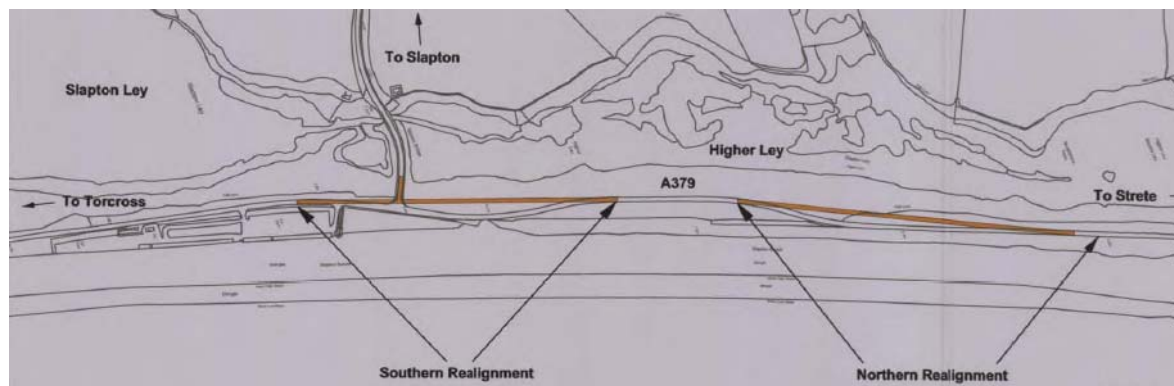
New section of road set back 21m from the existing storm damaged section
